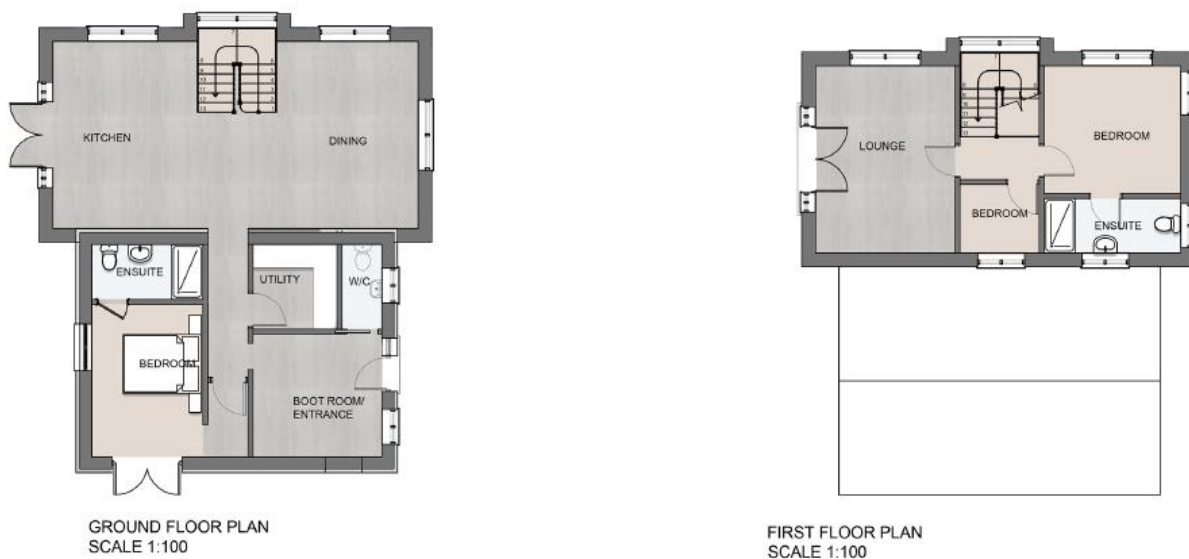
highlights the simple internal alteration which replaces the first floor office with a bedroom and retains the bathroom as an ensuite.
